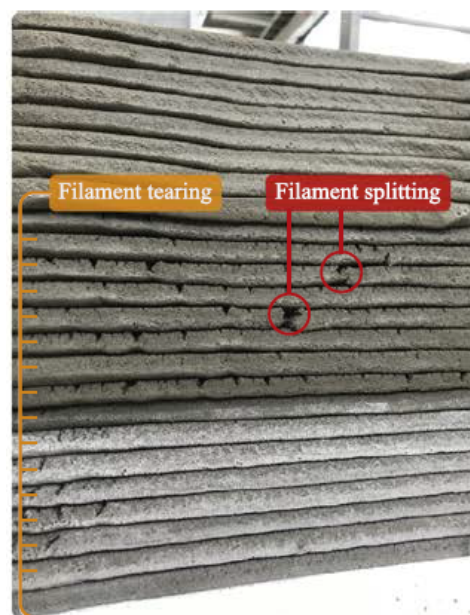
Extrusion defects in 3D printed specimen [1]
